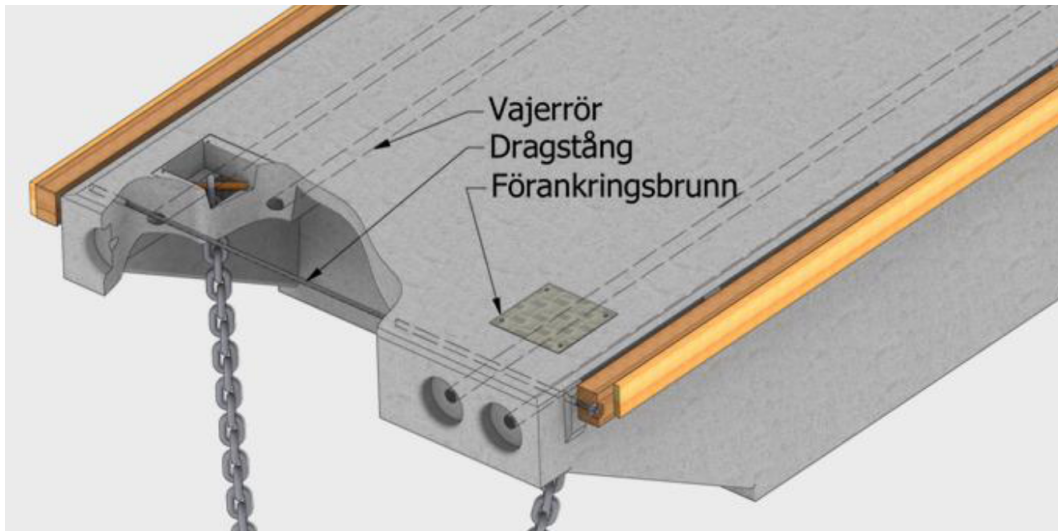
Concrete element. PHOTO: RIXÖ-bryggan
